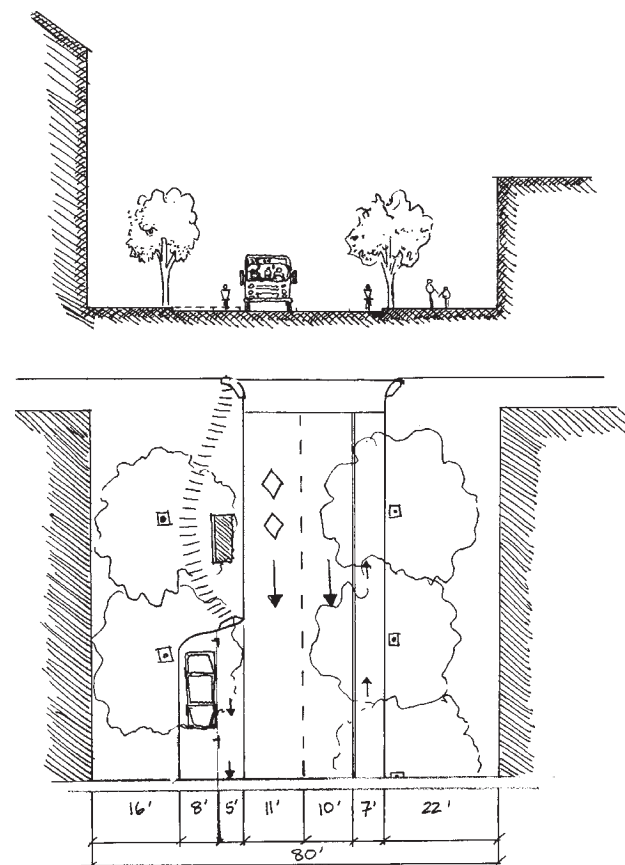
Pine Street -- Conceptual Plan & Cross-Section
